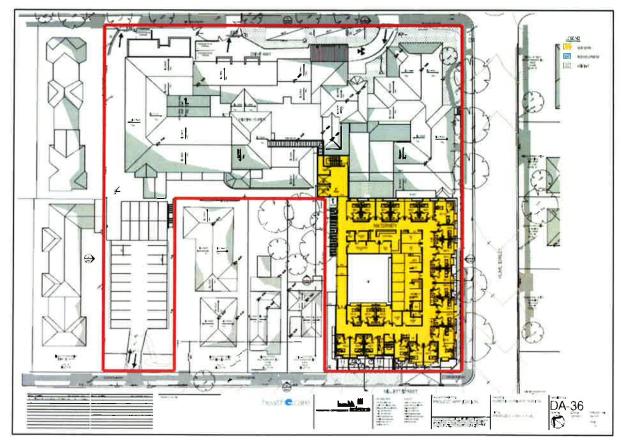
Project Layout. Typical floor plan of the proposed new building at the corner of Pearl and Millett Streets, coloured yellow. The overall hospital site is outlined in red.
